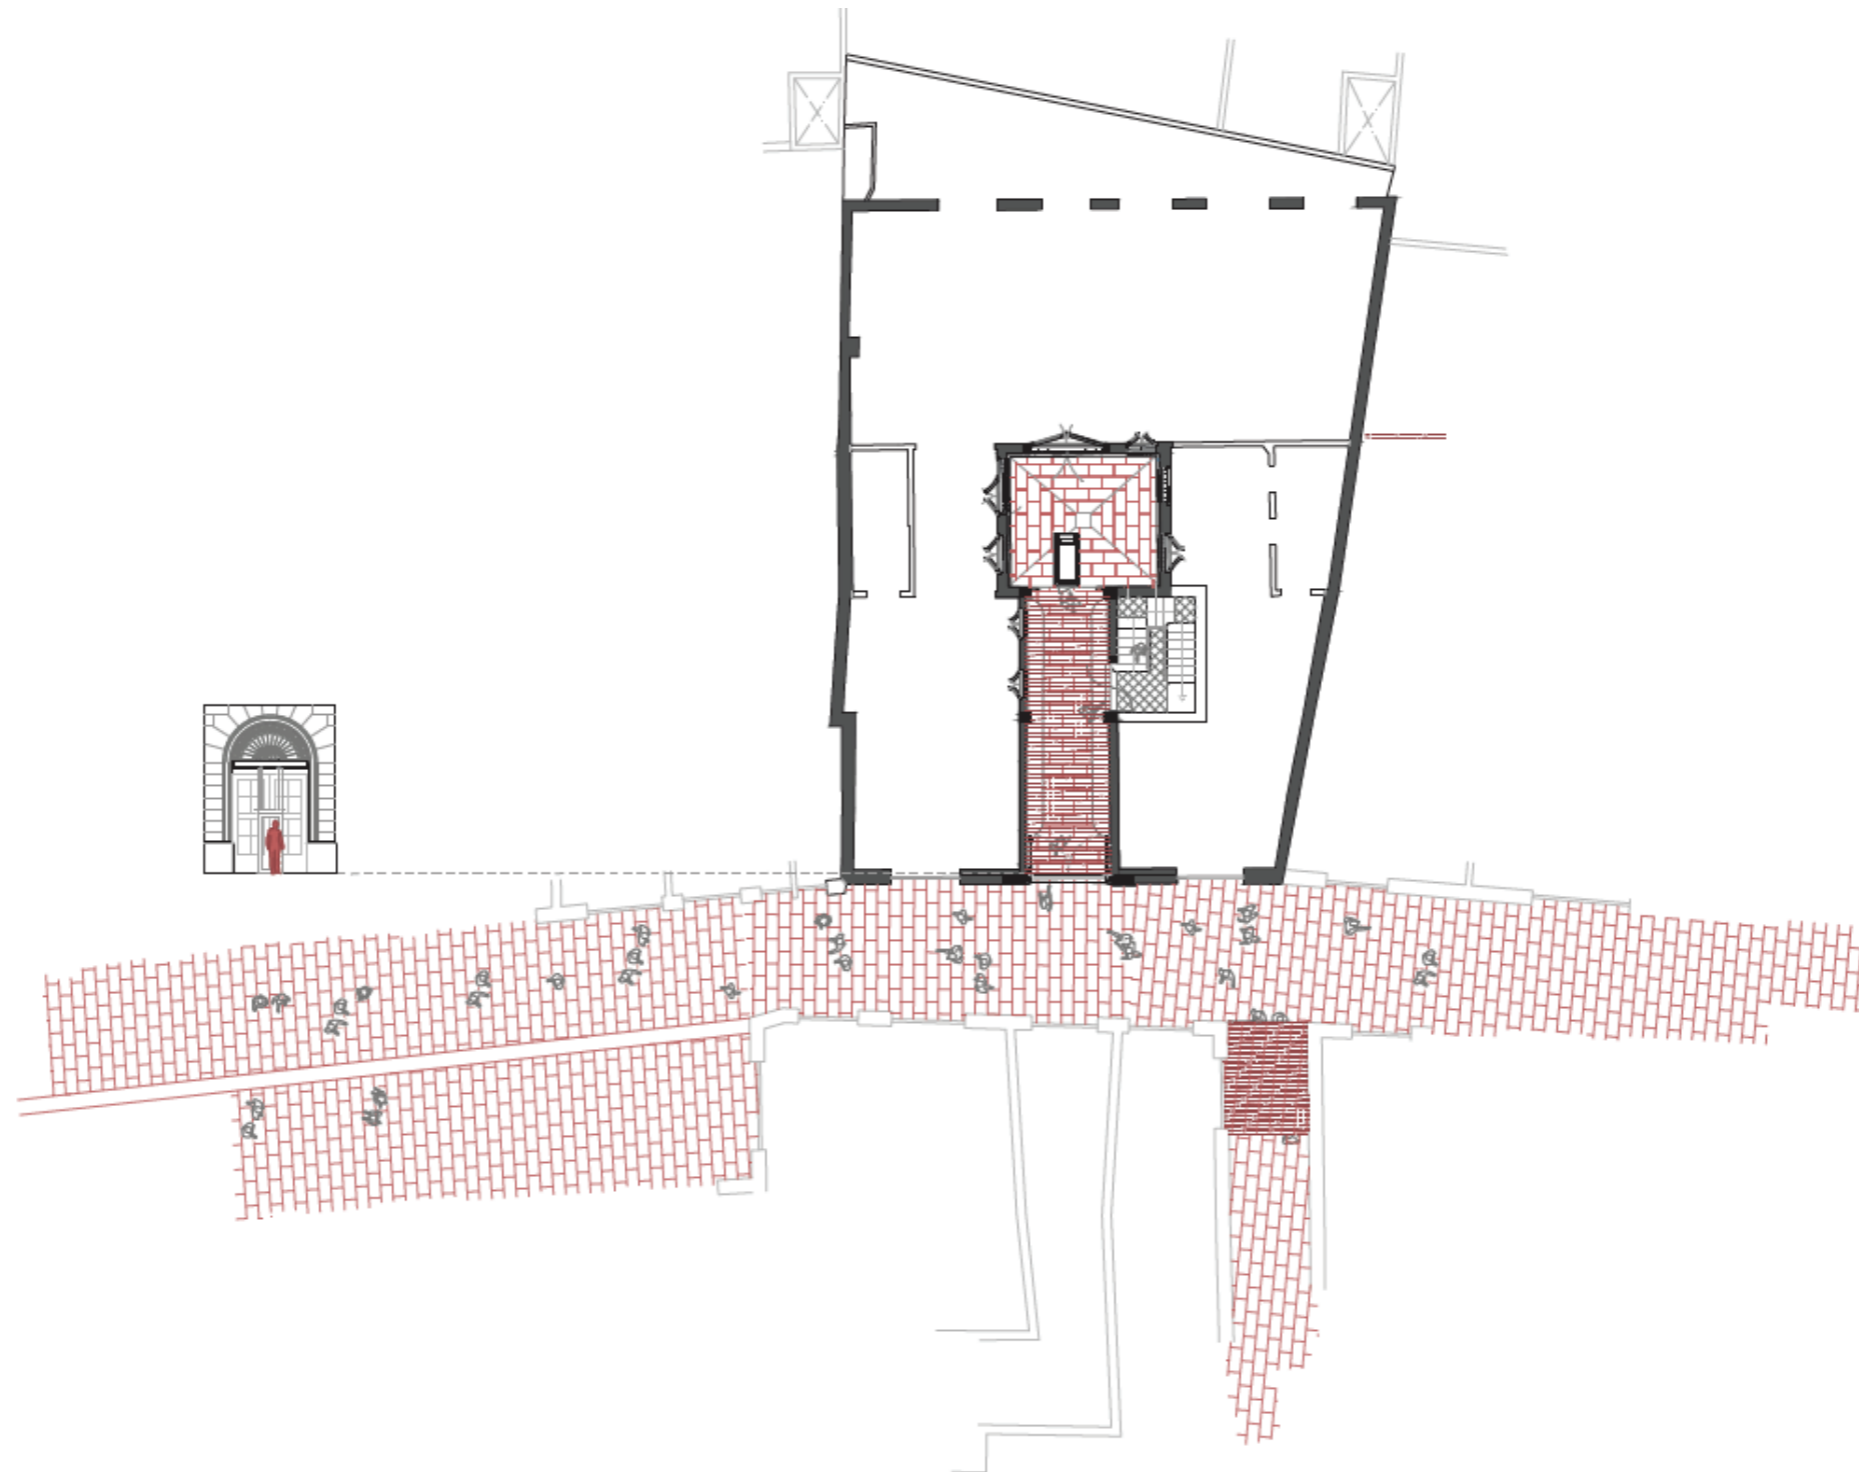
Ground-floor plan, highlighting the concept of the streets flowing to the inside of the building.
